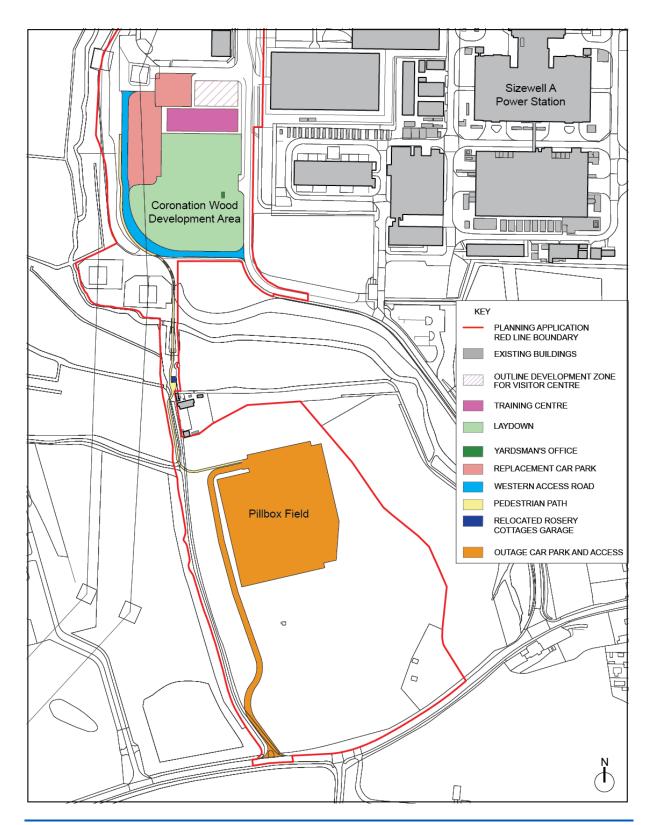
Proposed Location of the Pillbox Field Outage Car Park Facility
